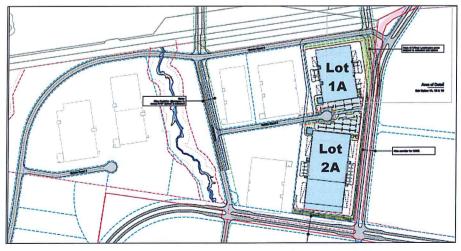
DHL Logistics Hub Site Plan (MP 08_0066)
